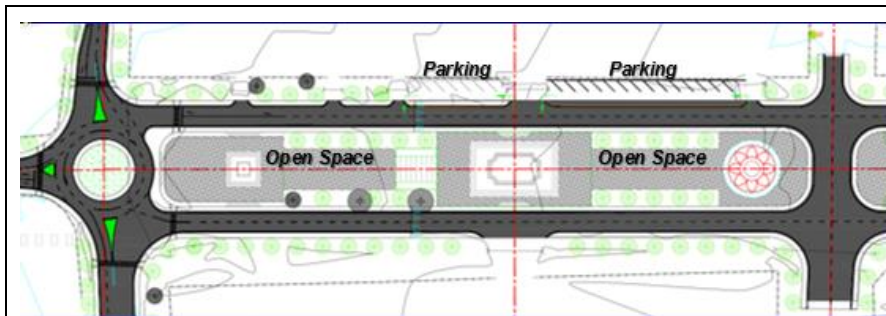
Typical cross-section of Fa Ngum Road (East, Park)
